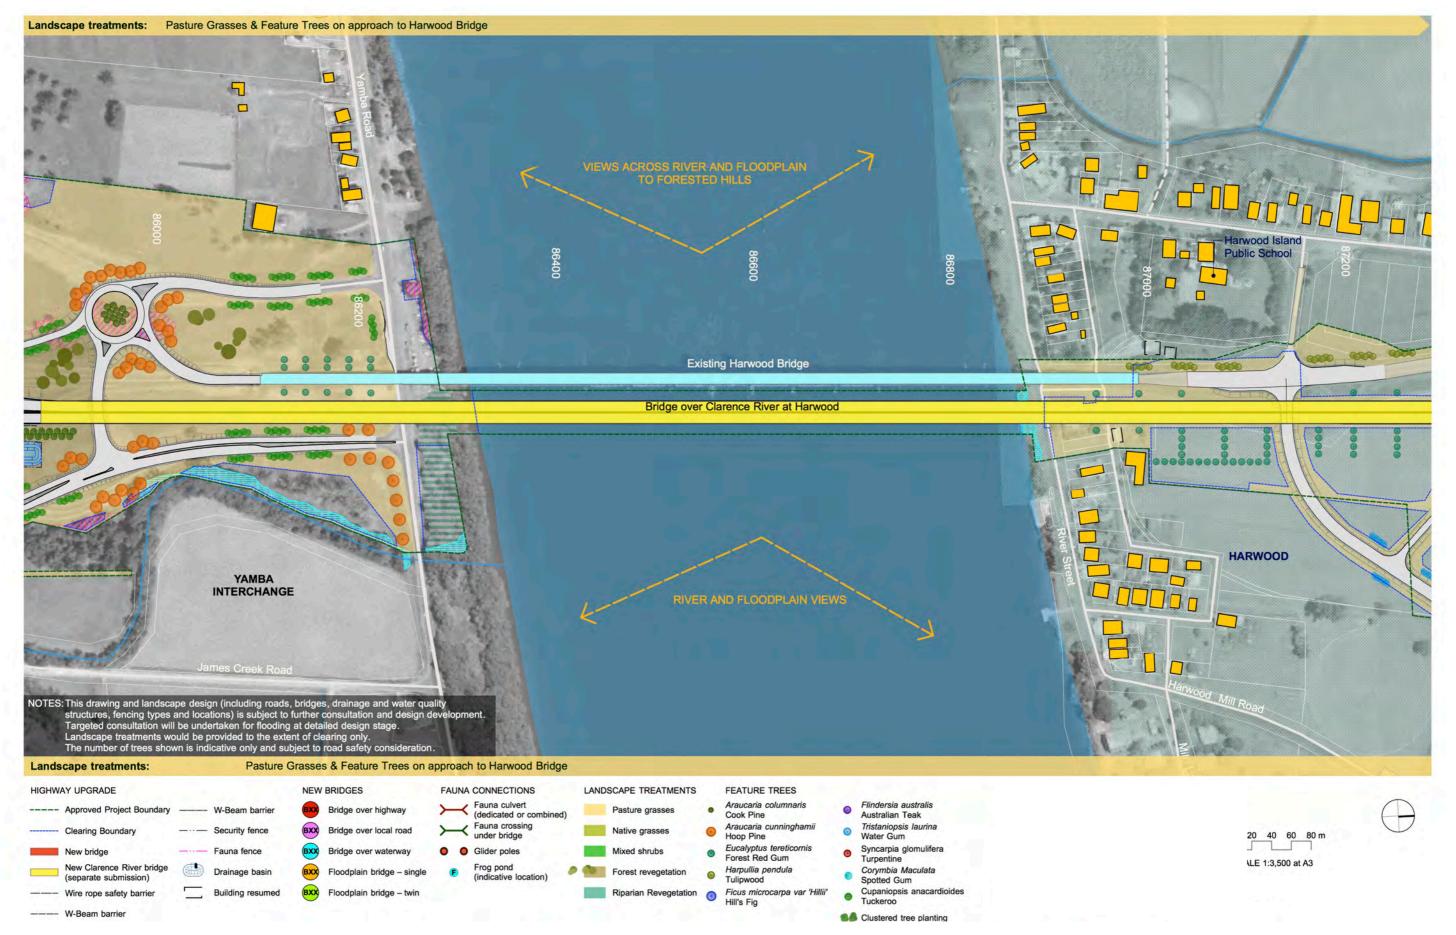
Overview of landscape concept at the bridge over Clarence River at Harwood
